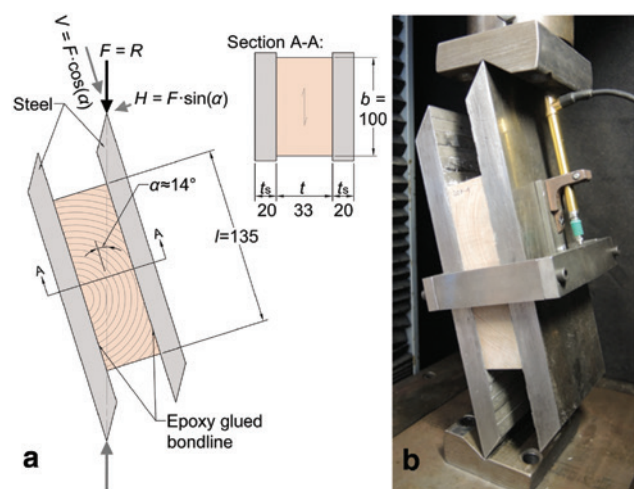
Employed test setup: (a) technical scheme with dimensions (in mm); (b) view of the realized test setup with fixed LVDT slip measurement.
